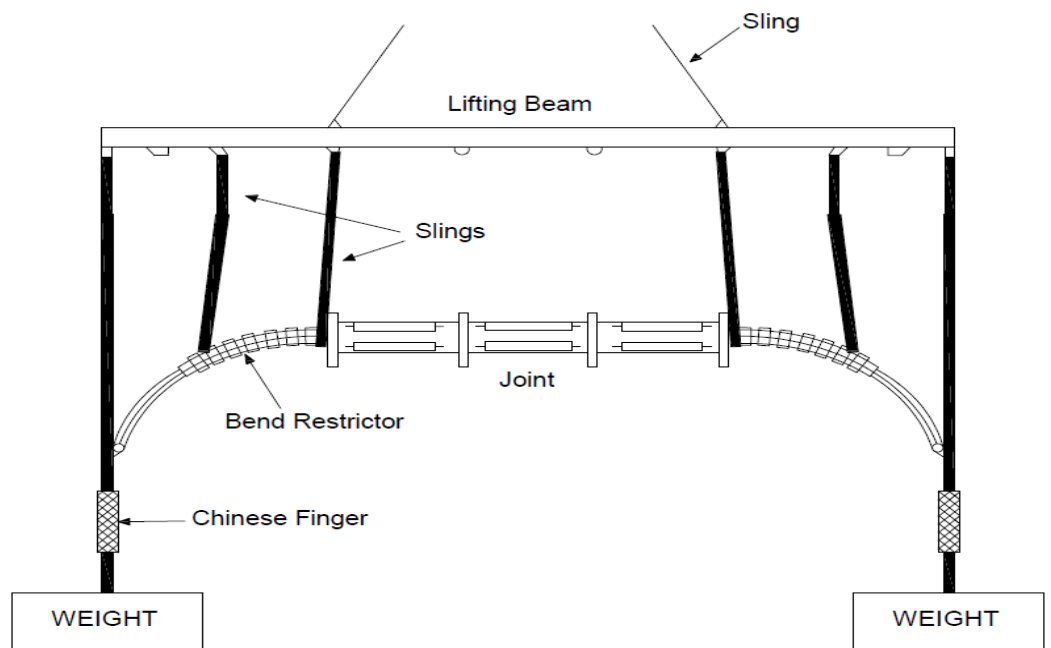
Offshore field joint deployment rigging arrangement for Omega laying (hanging position).
